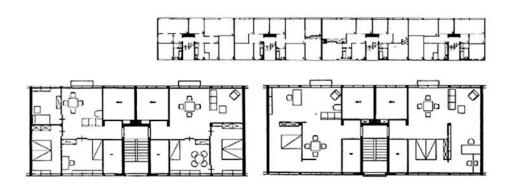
d.11. Mies van der Rohe: Siedlung Weissenhof, Stuttgart, 1927.
